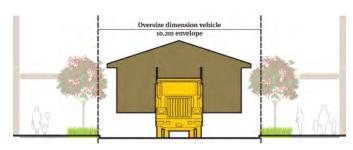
Marriner Street-west / Wakefield Avenue over dimension route with proposed street landscaping.
